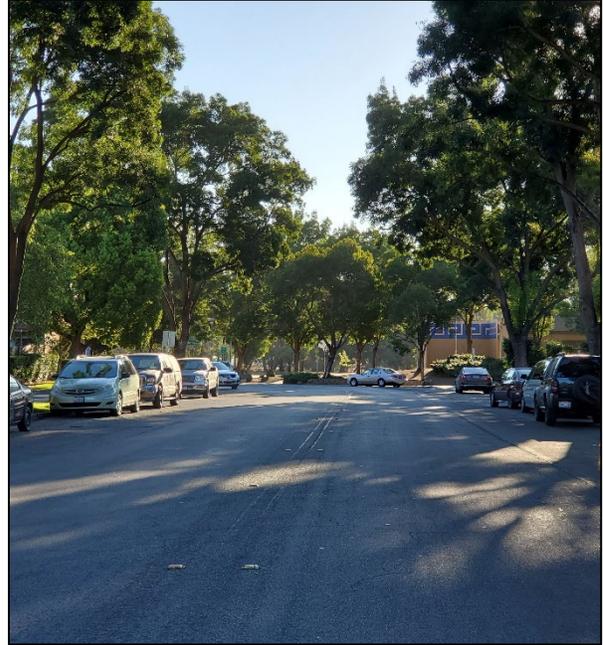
Sewer trunk line route through already paved street surrounded by street trees.
